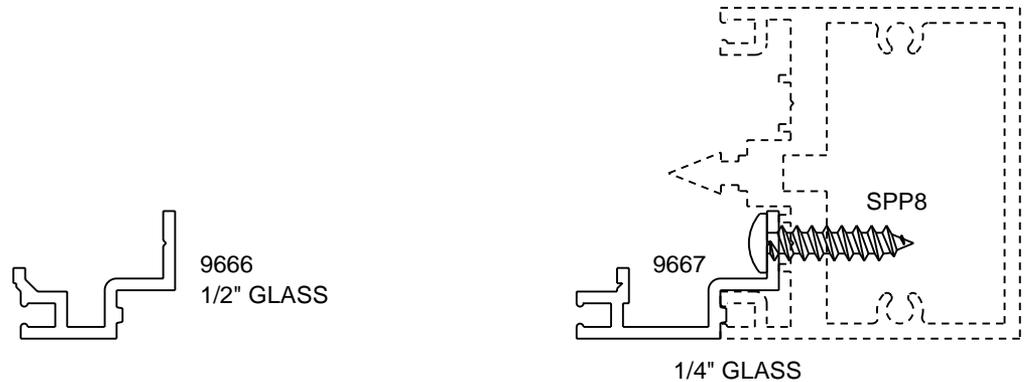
DETAILS SHOWING TYPICAL GLAZING CONDITIONS
